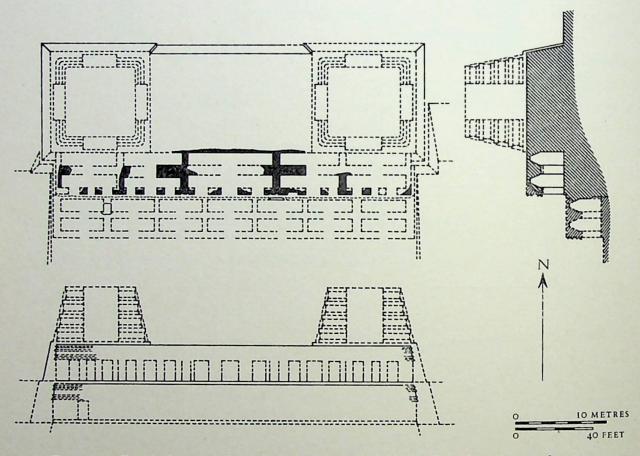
Becán, Structure I, seventh-eighth centuries (?). Plan, elevation, and section
